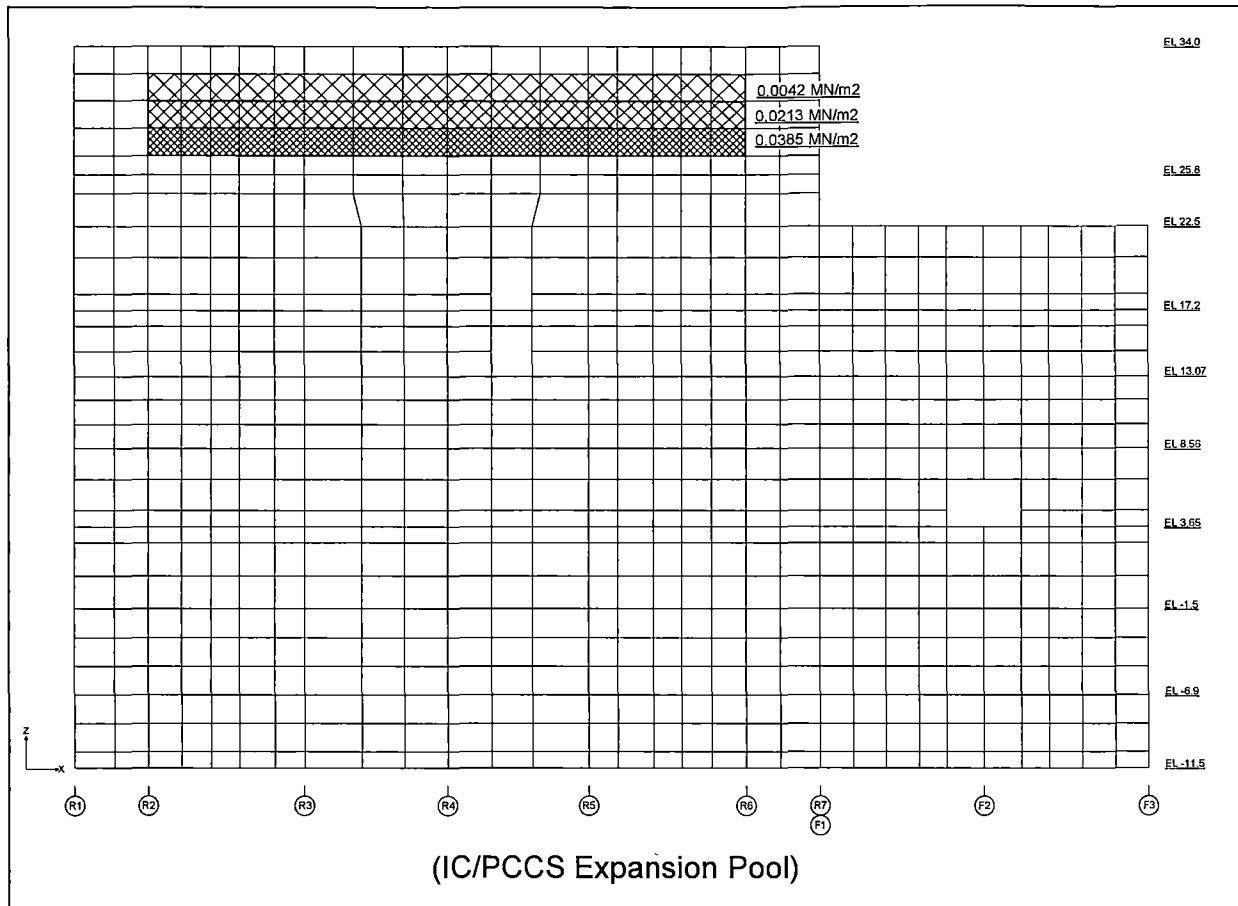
Hydrostatic Loads on the RG/FF External Wall
